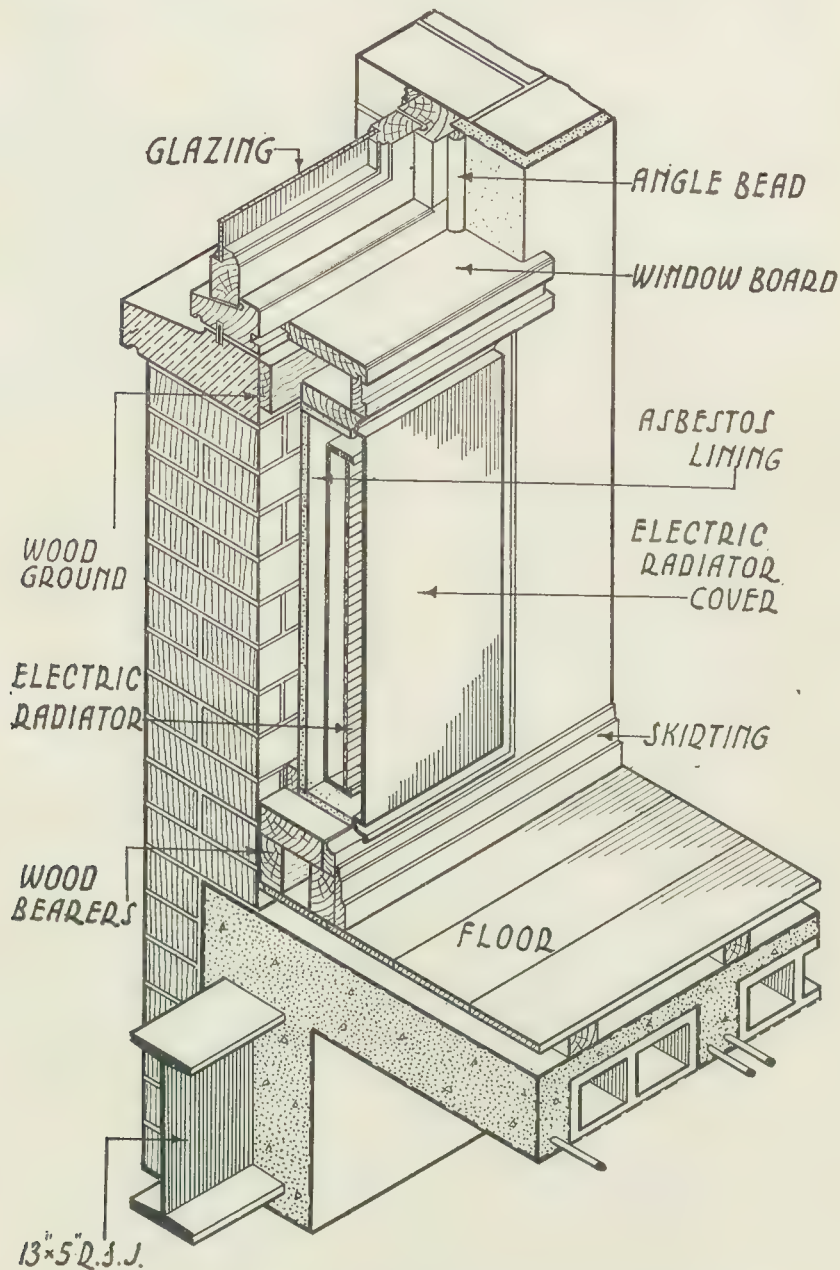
ARRANGEMENT FOR ELECTRIC PANEL HEATING UNITS
